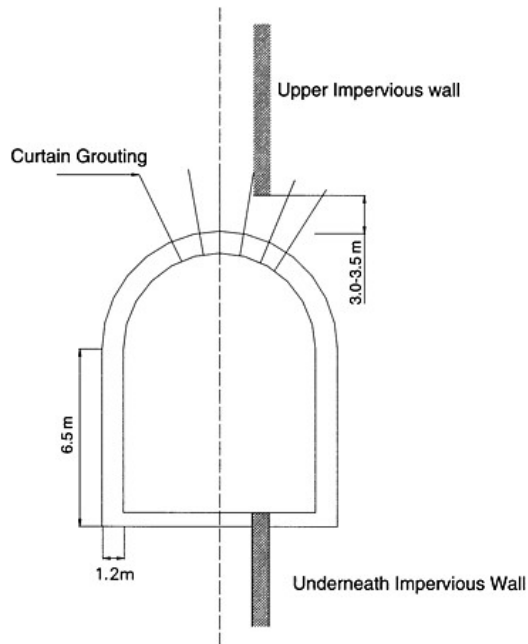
Sectional Drawing about Construction Gallery of Impervious Wall.
